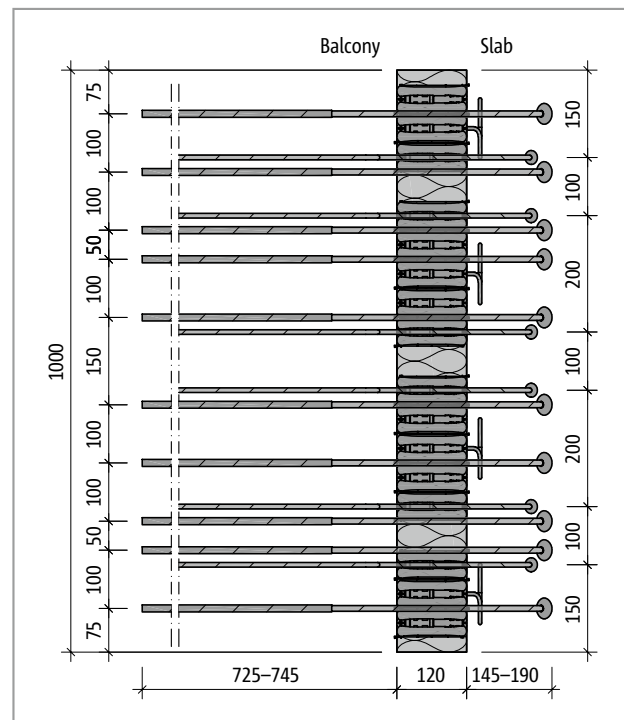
Schöck Isokorb® XT type K-O-M4: Product plan view
